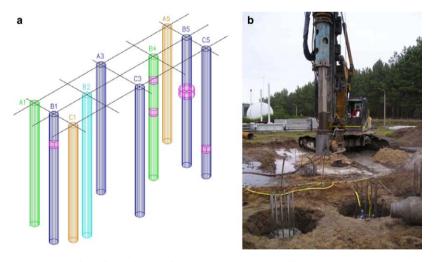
(a) Drawing of the pile test site with 10 piles and (b) pile test site under construction.
